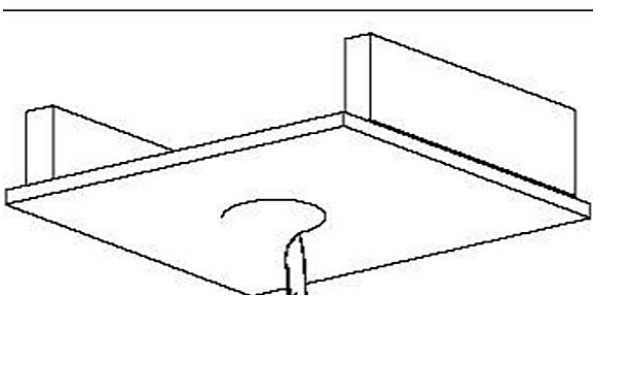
Use template if necessary (included with LED Wafer product) to cut-out a circle where the mounting plate opening is located.
